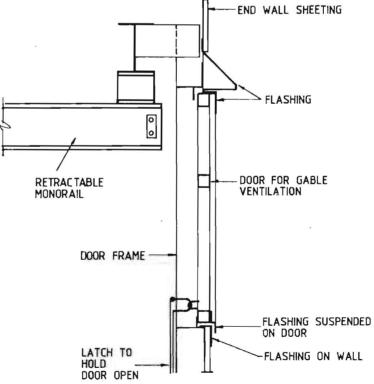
DETAIL OF DESIGN OF VENTILATION DOOR FOR EACH GABLE END.
